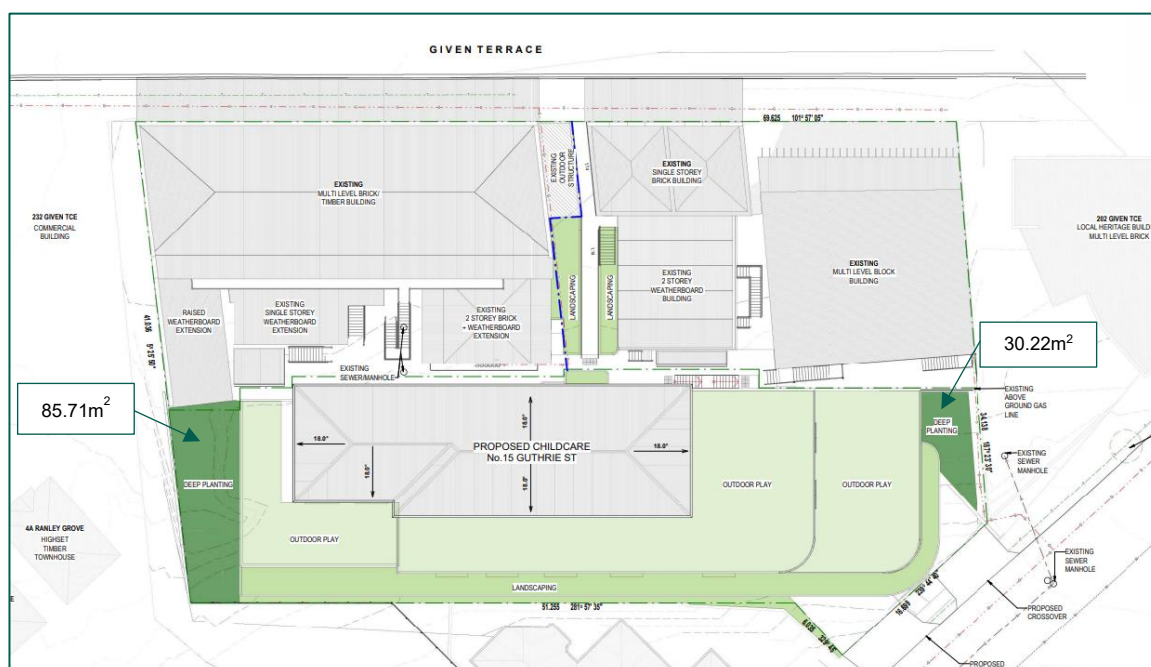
Extract of Approved Site Plan (A006476461) (Source: MAS, 2023)
